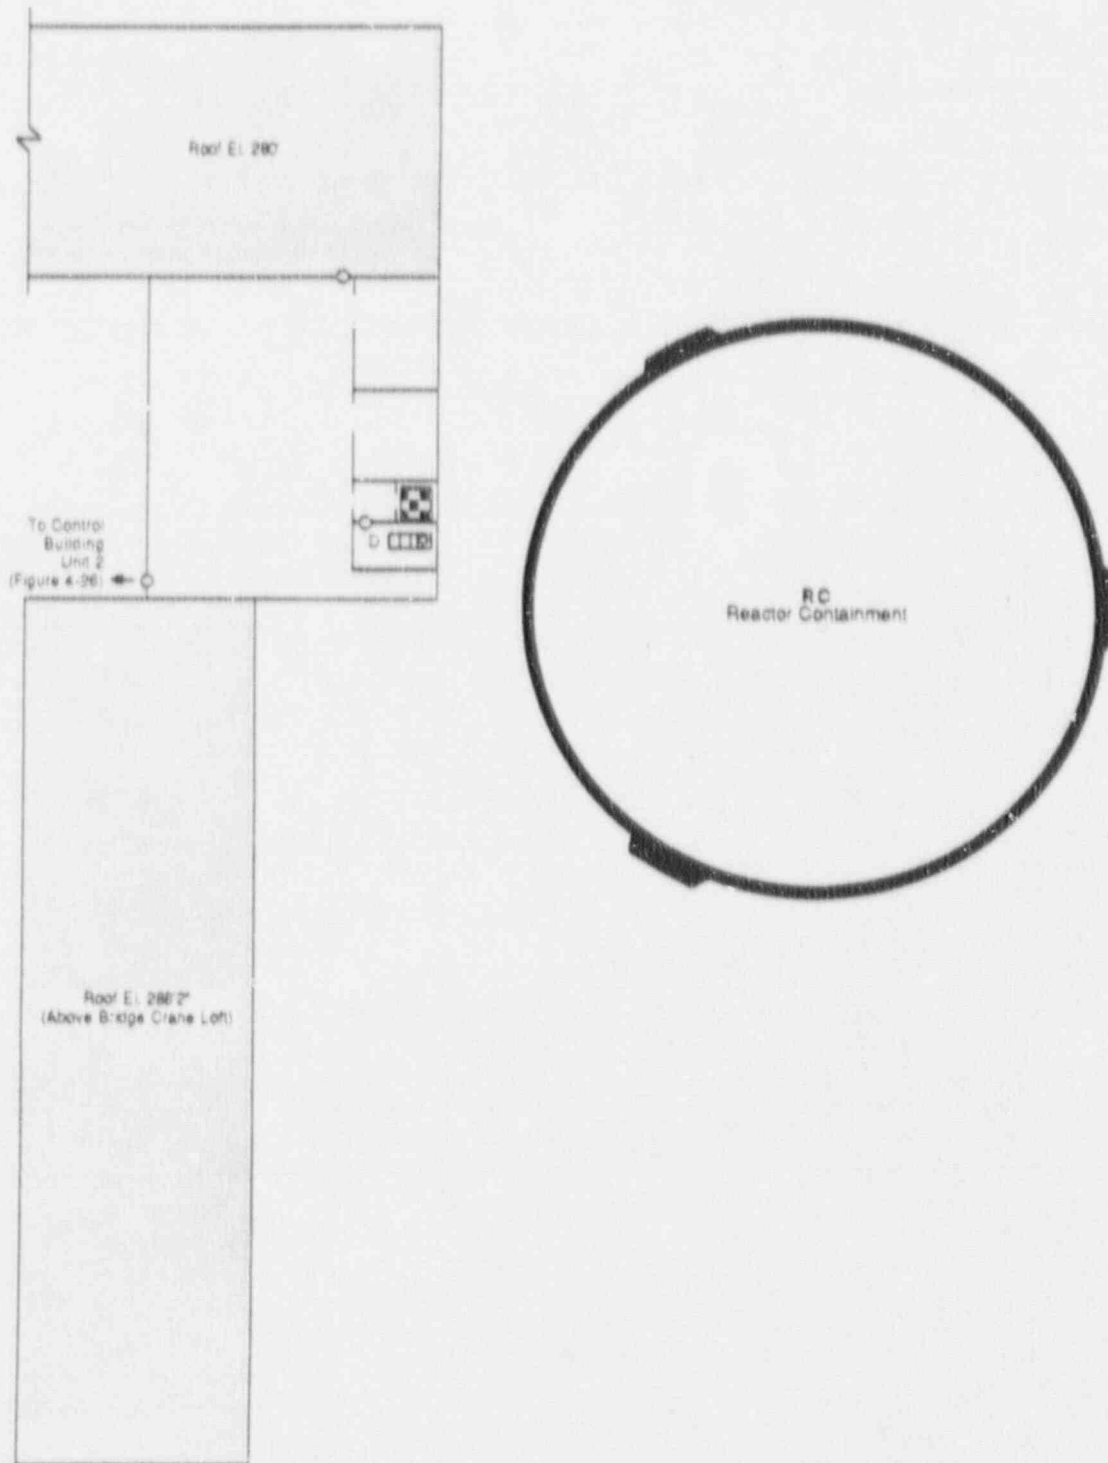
Vogtle 1 Reactor Containment, Control Building, and Fuel Handling Building, Level 4 (Elevation 280'-0")
